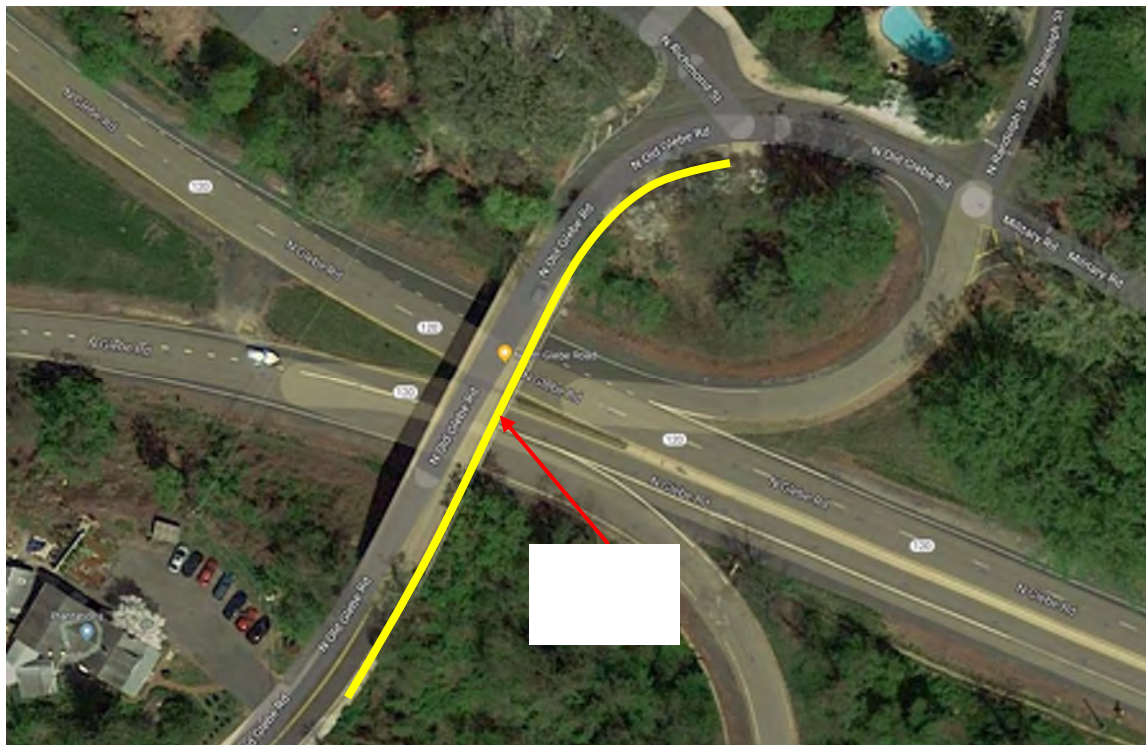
Old Glebe Road over Route 120 Bridge Aerial View
